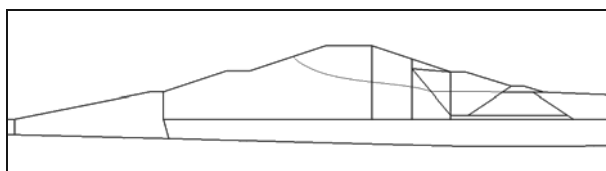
Variant 4 Material zones scheme – piping effect at dam base plus watertight facing within zone of concrete panels installation
